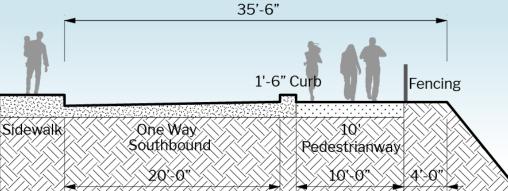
Existing Conditions: Excess parking pavement, compacted soils and lack of accessible pedestrian access.
